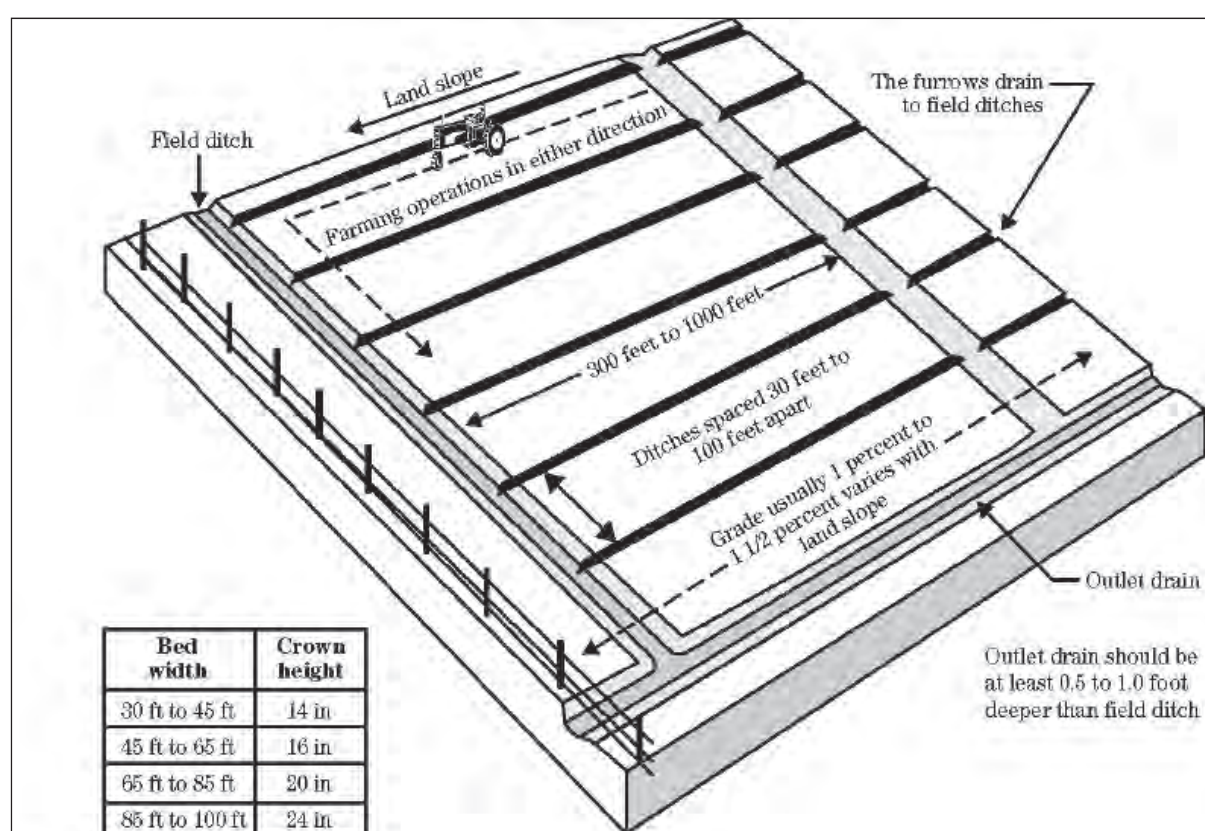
Bedding Drainage System (Bureau of Reclamation, 1978)
